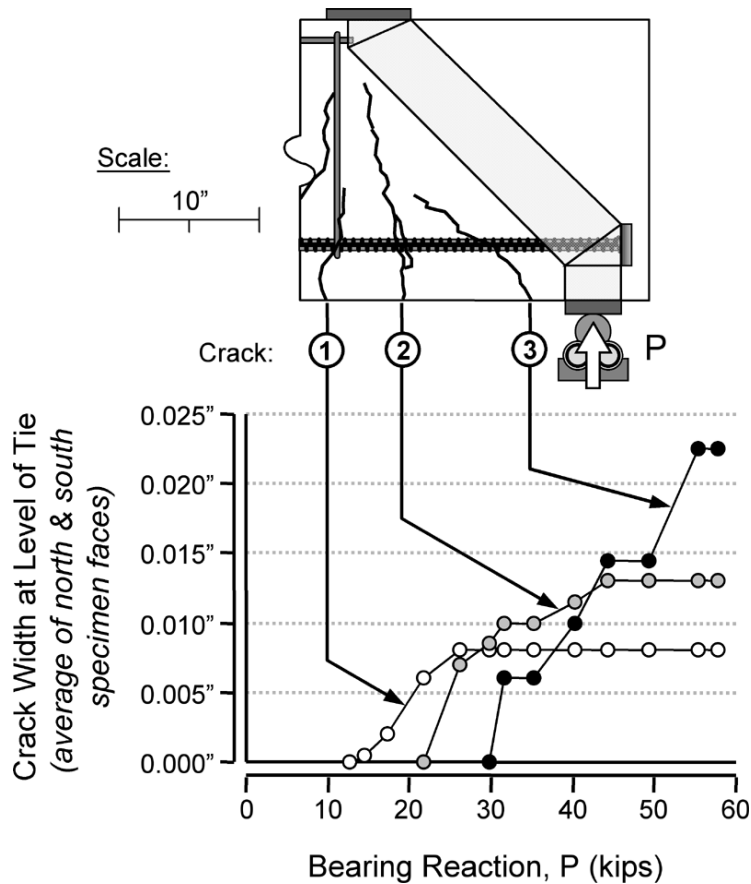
Crack width measurements from Specimen CCT-08-45-10.39-2
